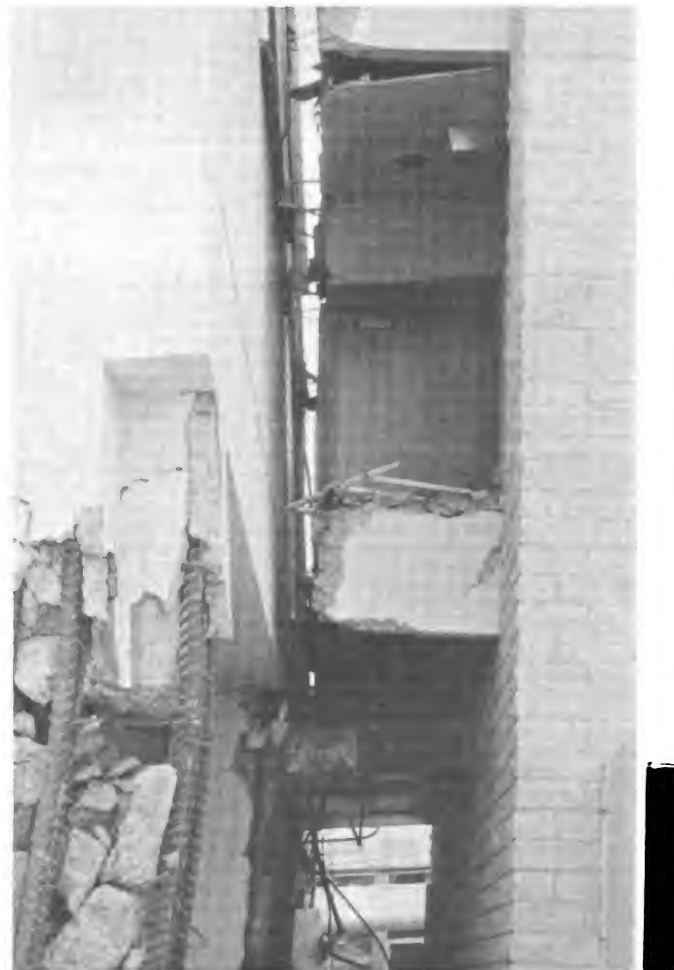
Olive View Hospital, medical treatment and care unit. Tilt of north stair tower from building viewed from ground-floor level.
